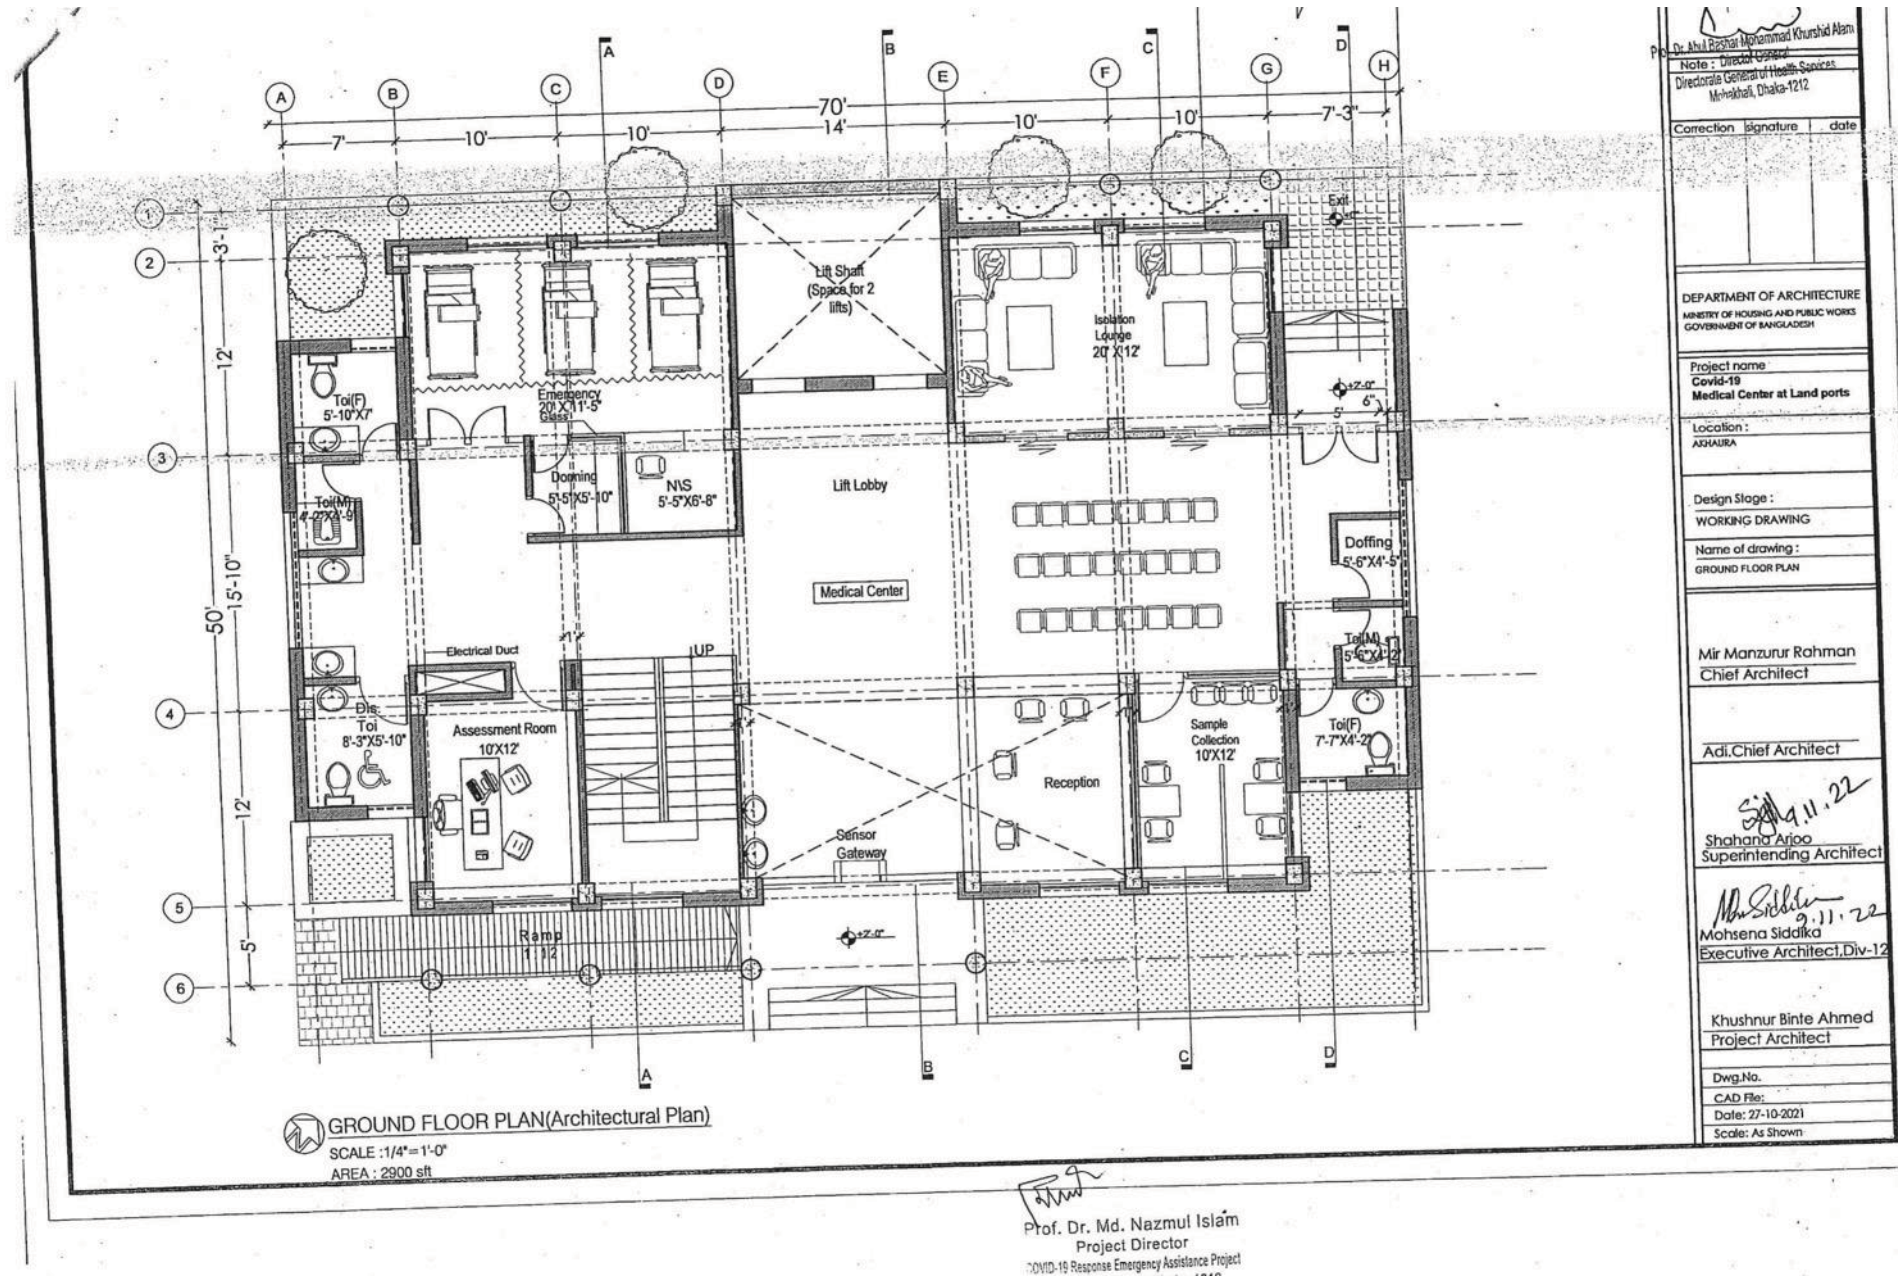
Ground Floor Plan of the Proposed Medical Facilities
